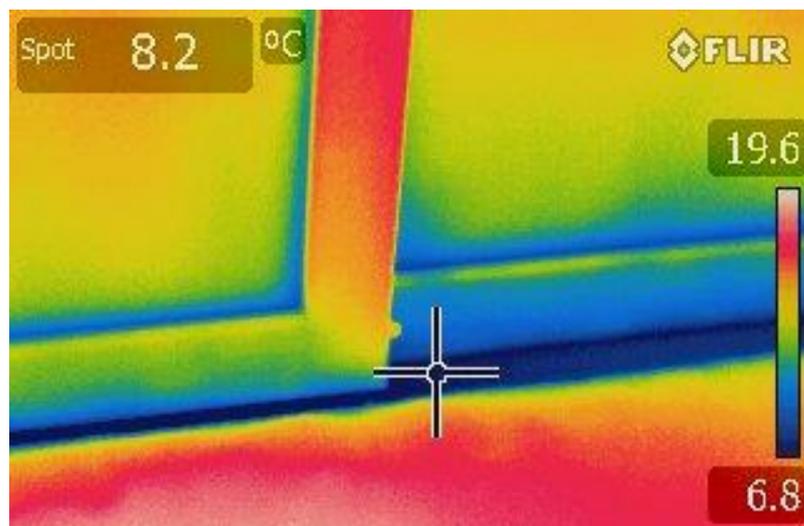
Alleged Ill-fitting Balcony Doors Phase 1 Heat Loss
